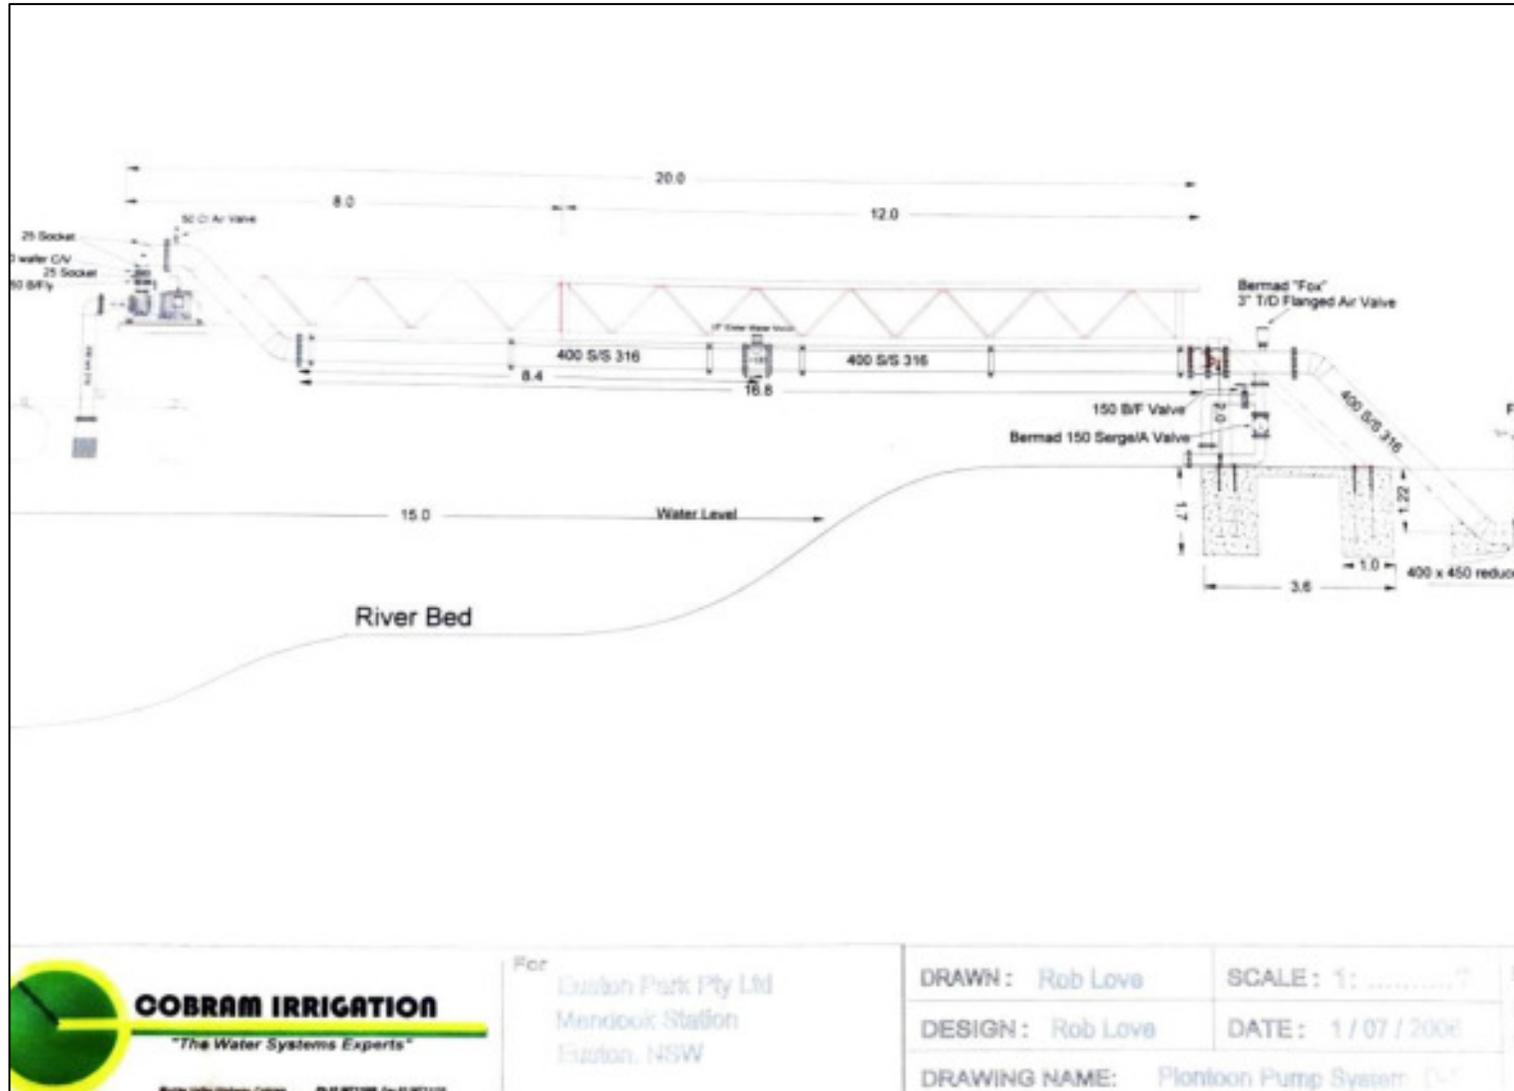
Profile elevation of the proposed pump site (specifications of the original pump site)
